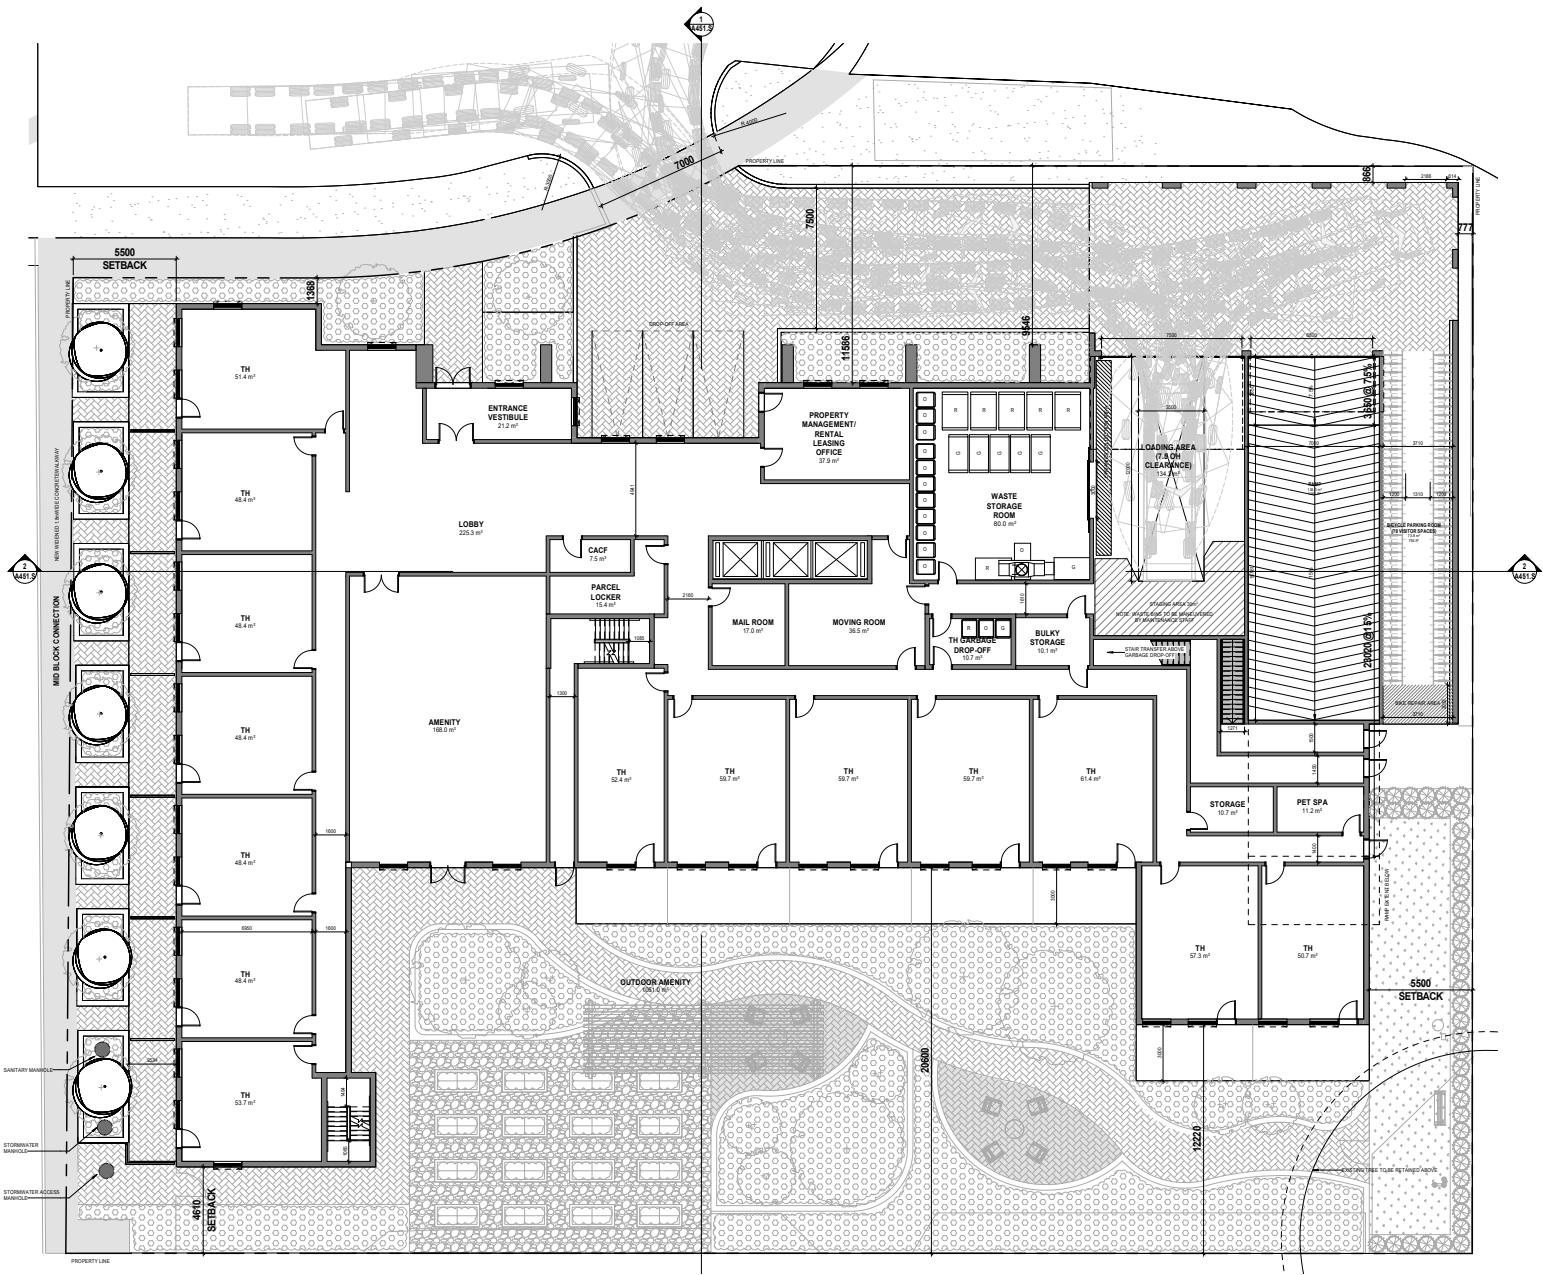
Ground Floor Plan (Prepared by BDP Quadrangle)
